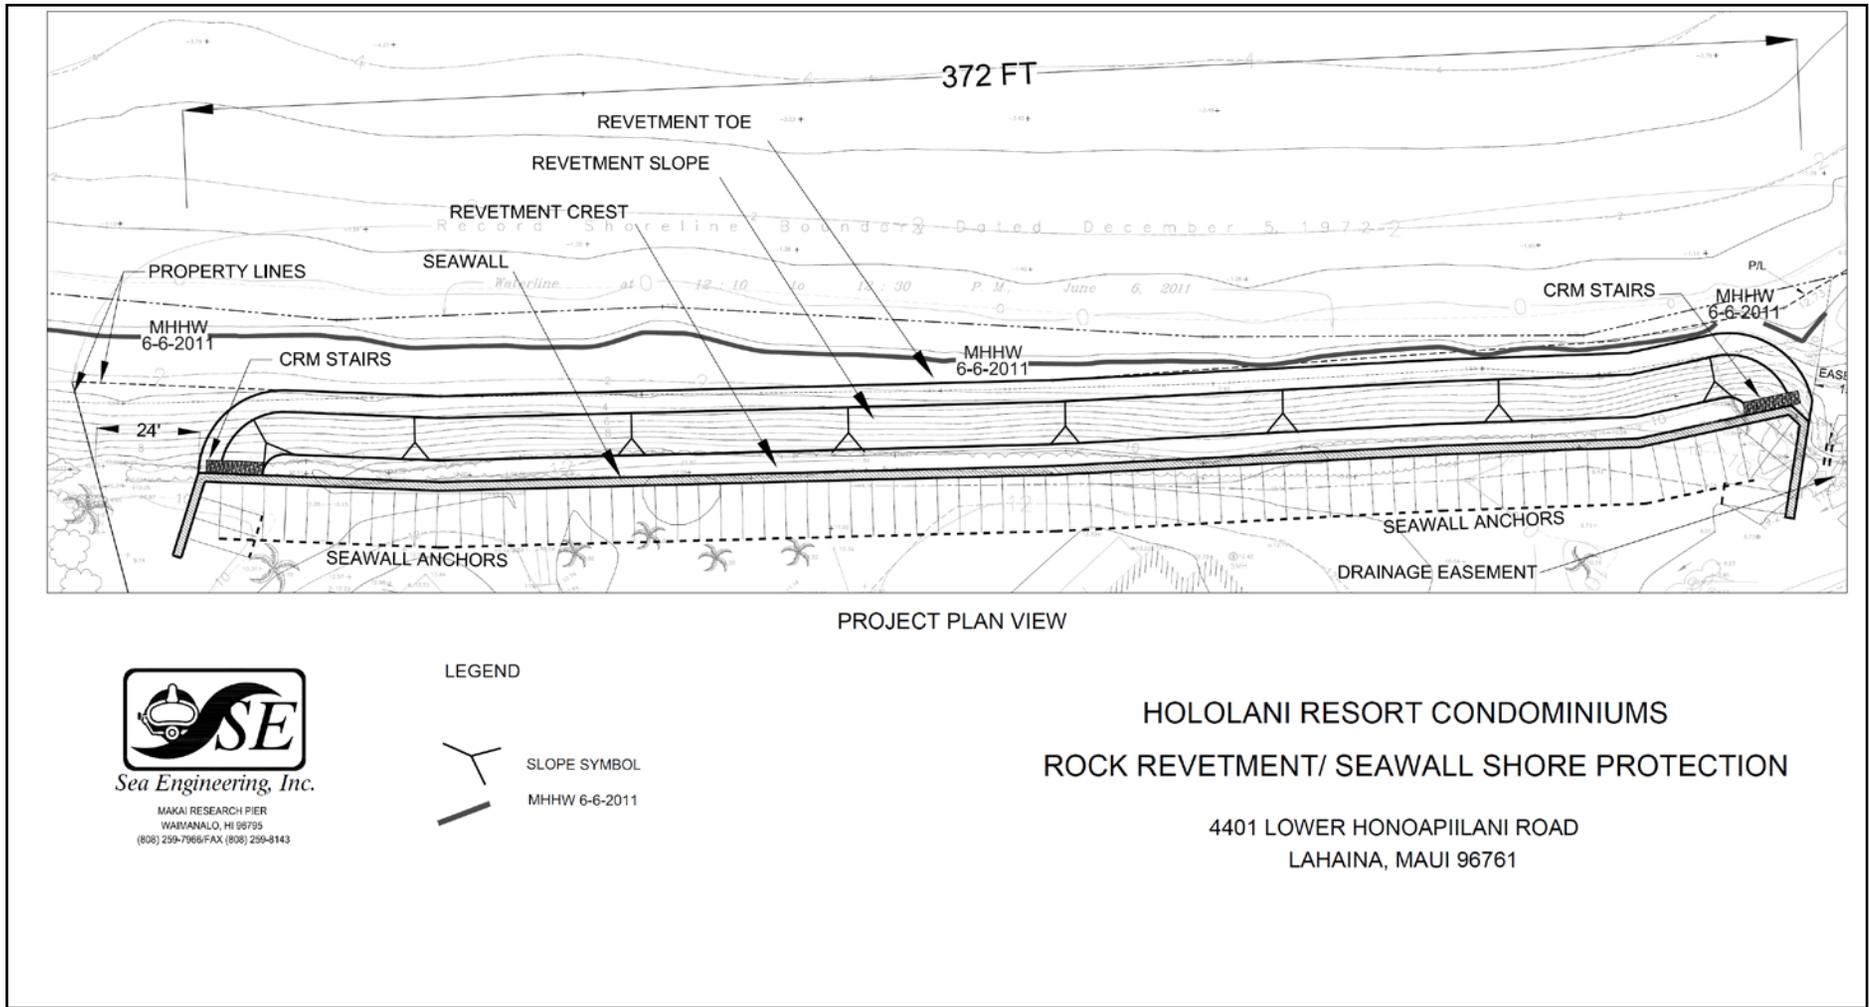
(a). Layout of proposed hybrid revetment and seawall
